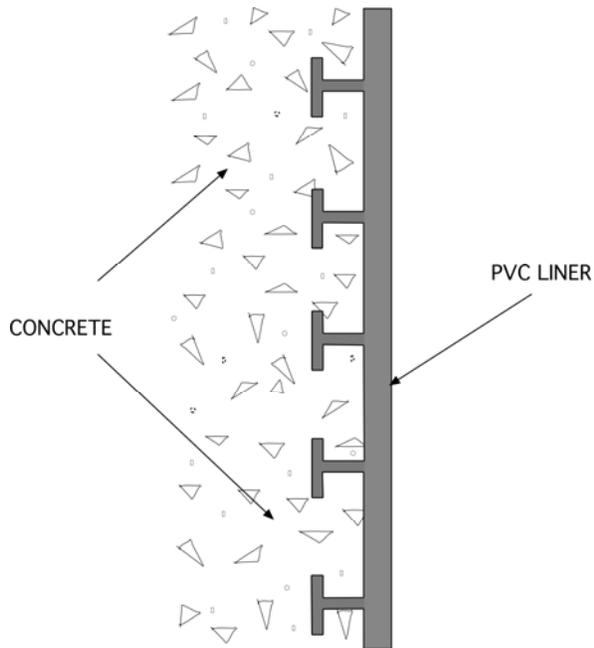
Typical Cast-in-Place Liner Profile on Wall
